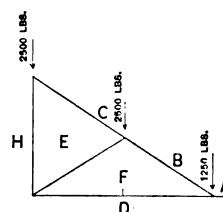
Skeleton of King Post Truss.—Scale, 3-32 Inch to the Inch.
